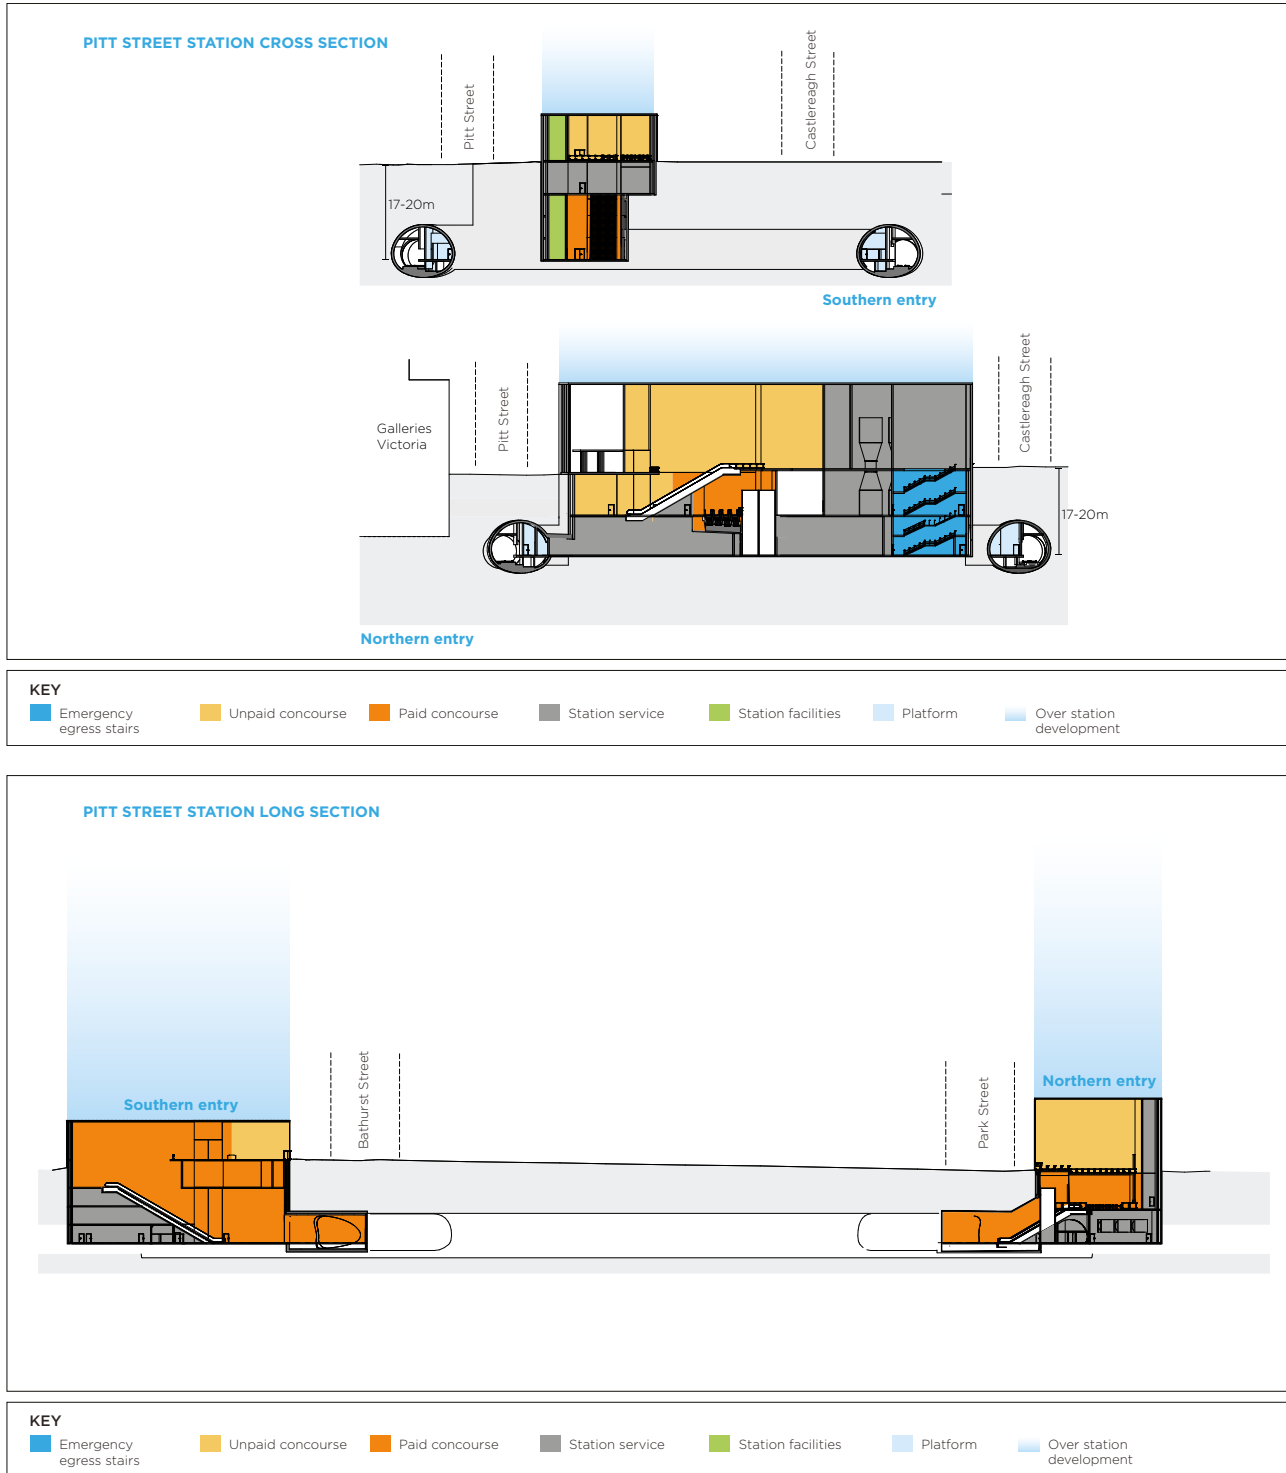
Pitt Street Station - indicative cross-section and long section
